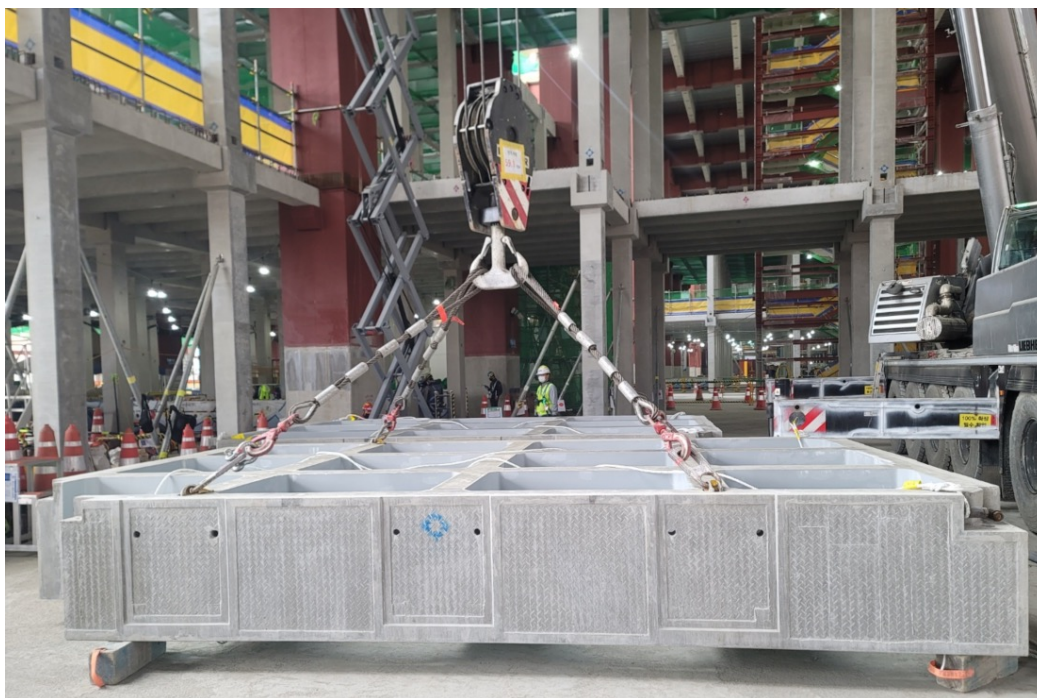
Inclined lifting of a precast concrete component. Photo courtesy of Samsung C & T Corp.
